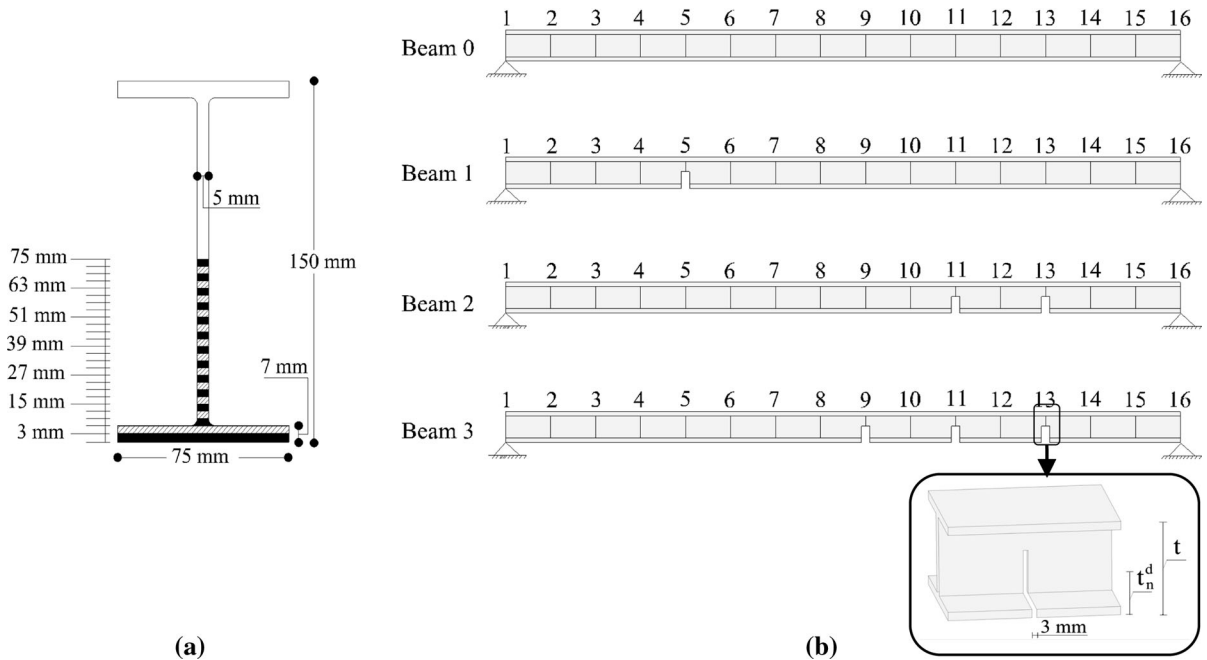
I-section specimen. a Dimension and damage depth of beams, b damage location of beams
